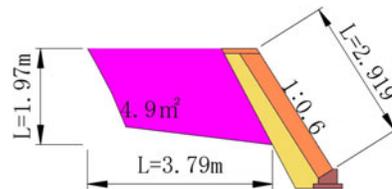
Drawing of a retaining wall block from the CAD module of Photog-CAD®
